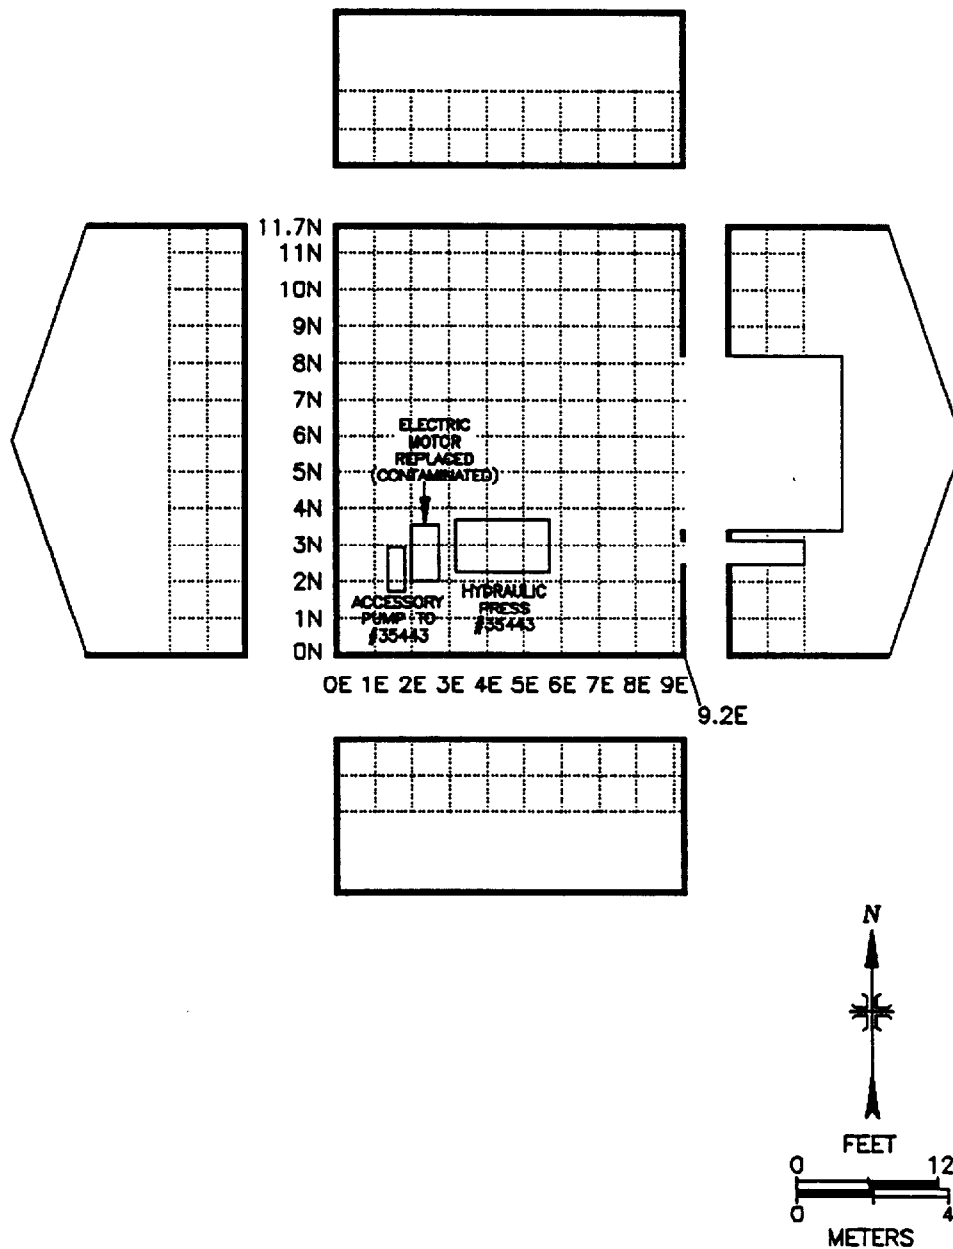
Building 3, Room 102 – Location of Hydraulic Press #35443
